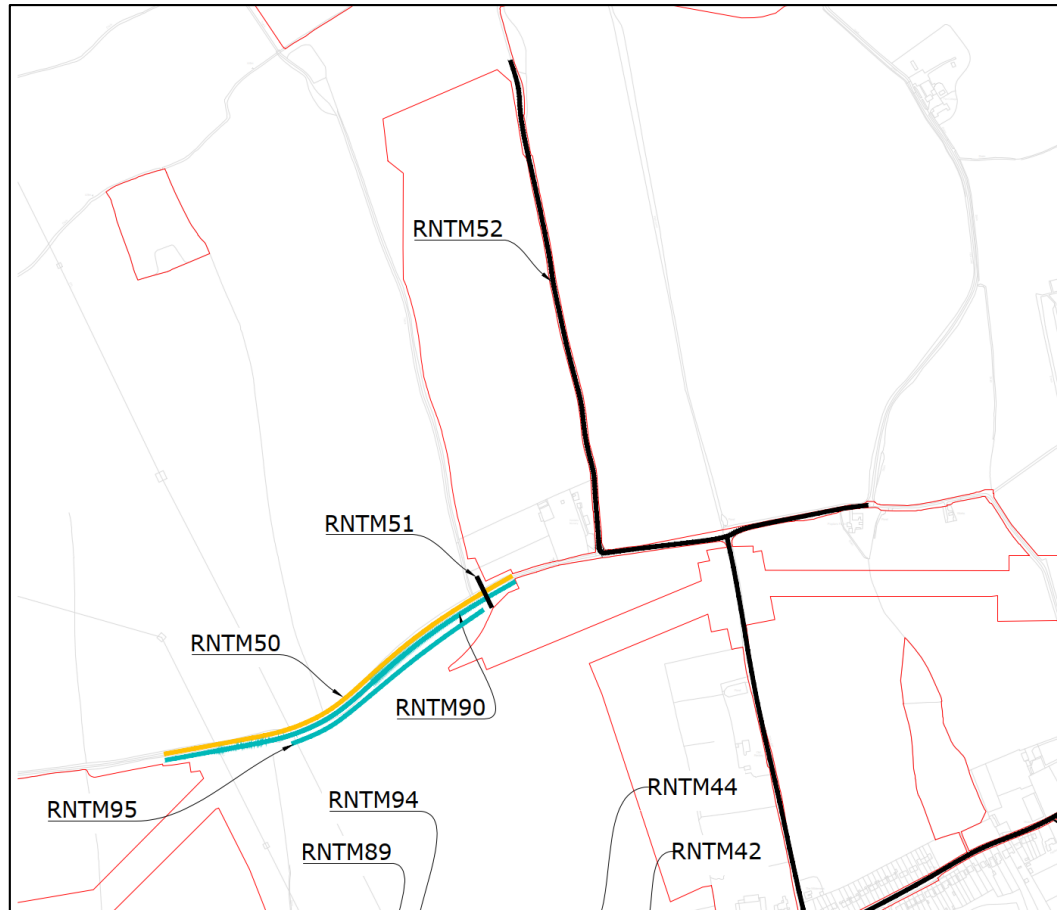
Roads North traffic management measures location plan (7 of 8)
